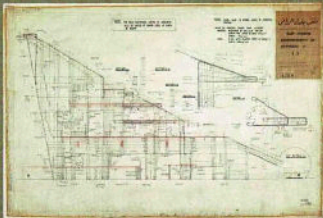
Vail 1-2, reinforcement elevation of Gymnasium, Pissoneir, April 1961, 31.4 x 24.2cm.
